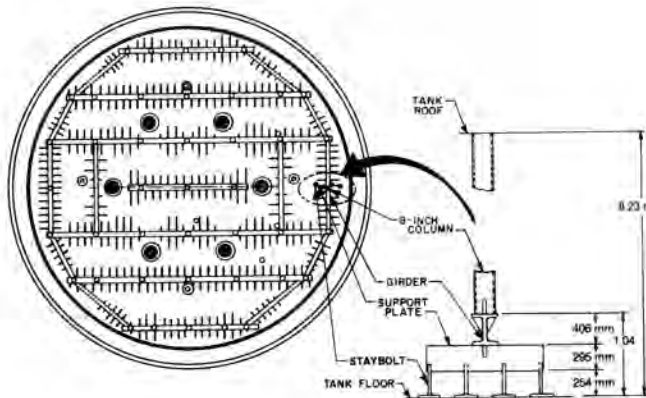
Tank 8D-1/8D-2 plan & elevation above internal gridwork.
